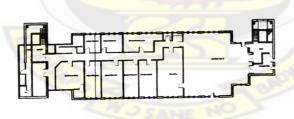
Third Floor Plan, Supreme Court Building, Ghana.
